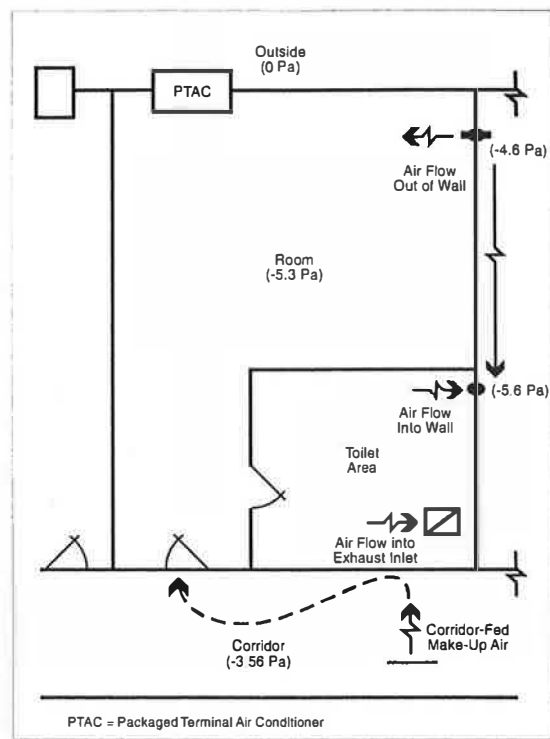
In case study 2, airflow visualization showed that air was entering the exterior building envelope and traveling down the demising wall.
